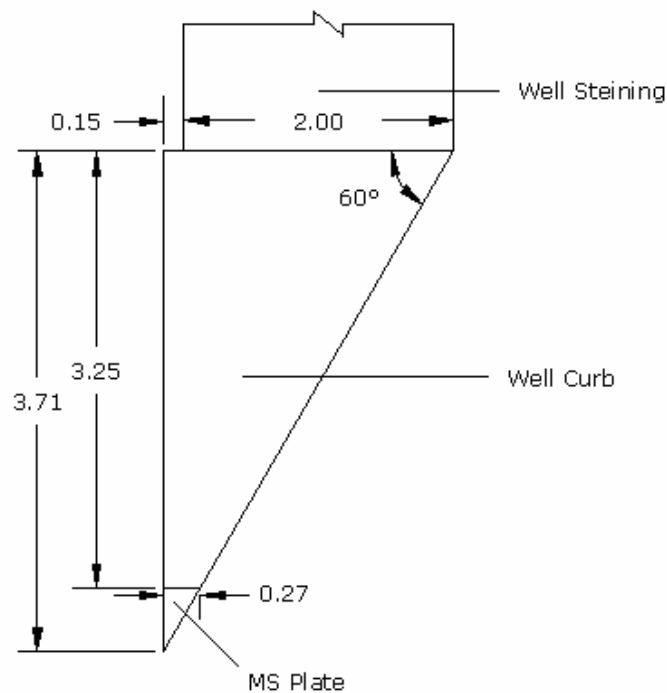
CROSS-SECTION OF WELL CURB
